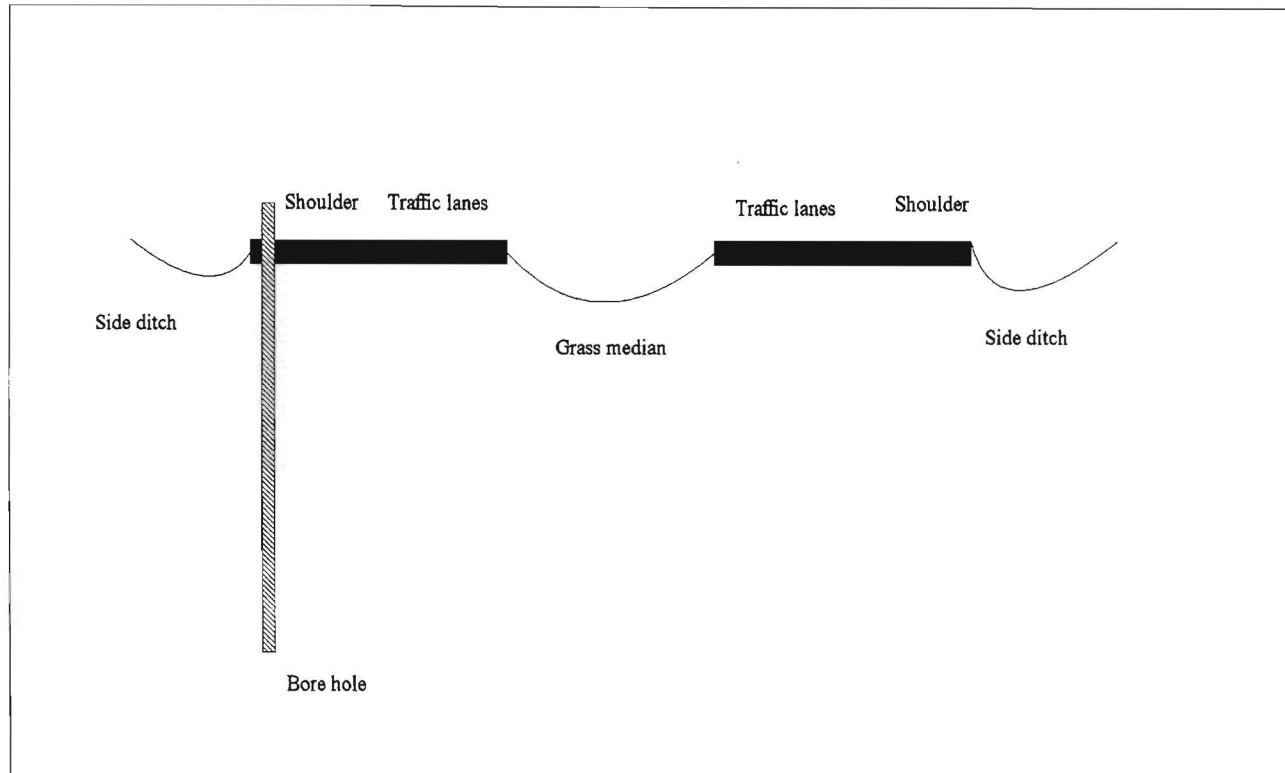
(b). Cross Section of Pavements Where the Borings were Made.
